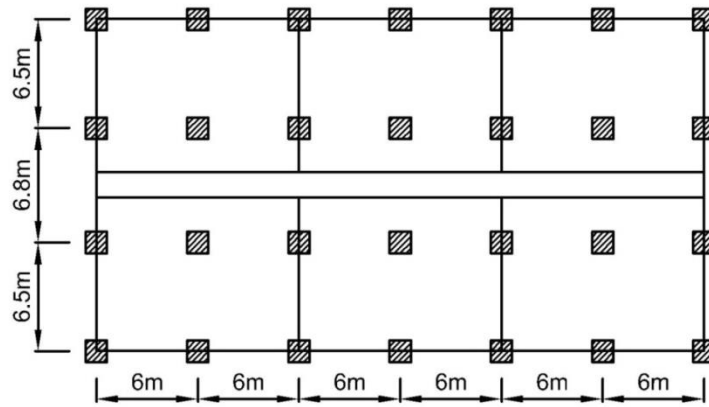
Foundation locations of the prototypical multi-family residential building
